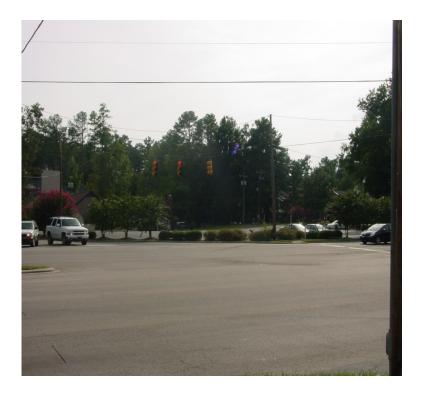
Head on View of Site across Highway 54 at Intersection of Finley Golf Course Road (Finley Golf Course Road on Left)
